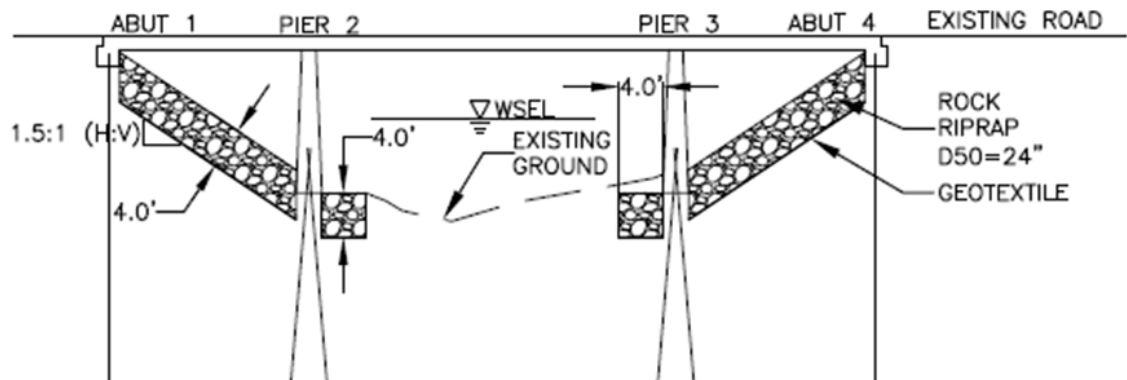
Cross-sectional view of Bridge G-17-AN with recommended hydraulic scour countermeasures
